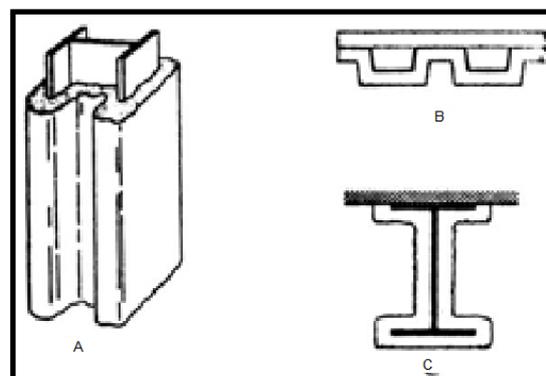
Contact protection (a: column, b: floor slab, c: beam)
